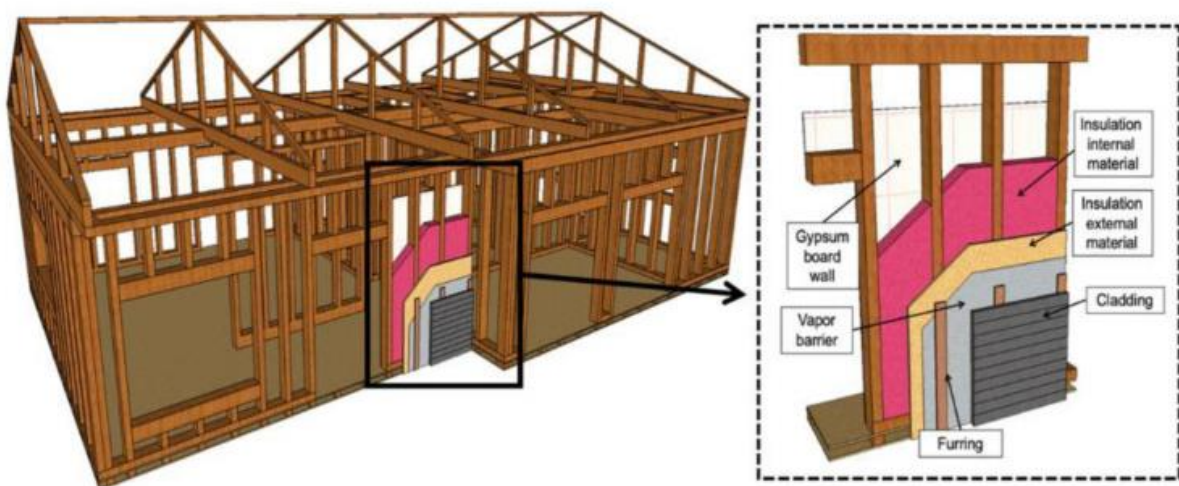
Schematic of a timber frame construction with wall configuration on the right (Cabral & Blanchet, 2021)
